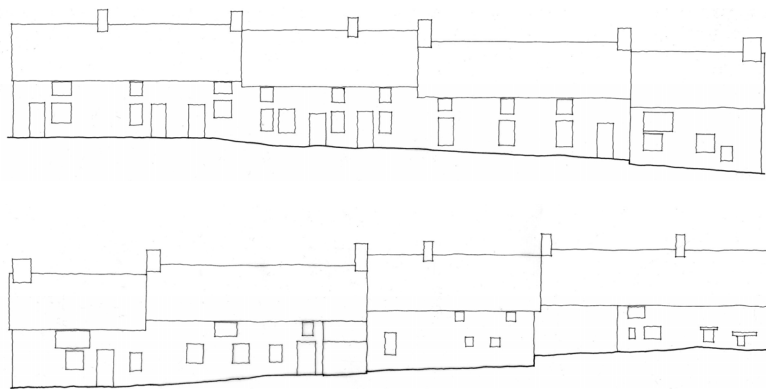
South elevation of the terrace at Gellideg; Fig.6.13 North elevation at Gellideg showing much smaller openings
